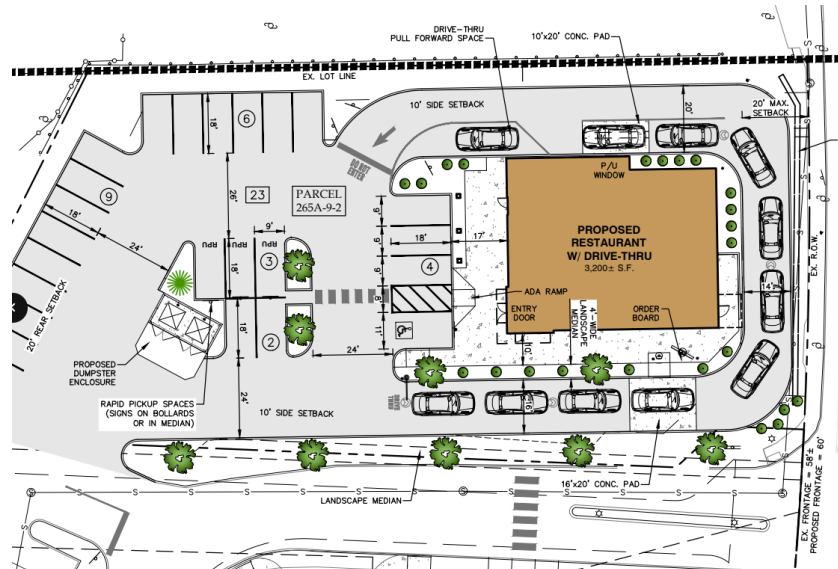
The conceptual site plan for 1220 Brighton Avenue
